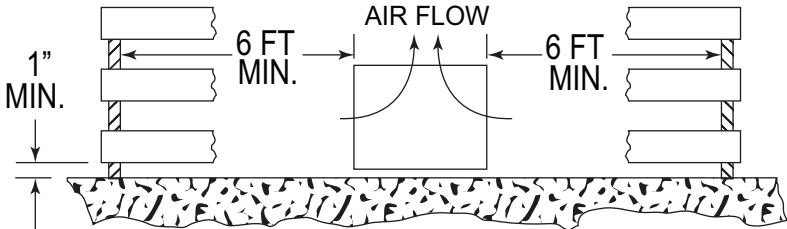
Remote ACC Installation When Installing Units in Pits
